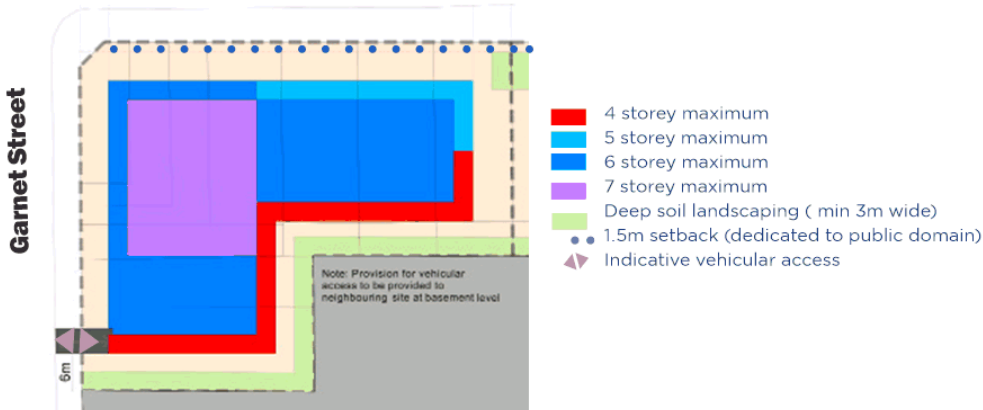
PROPOSED BUILT FORM PLAN
